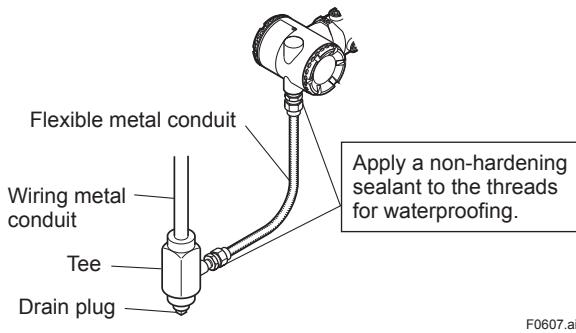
Typical Wiring Using Flexible Metal Conduit
